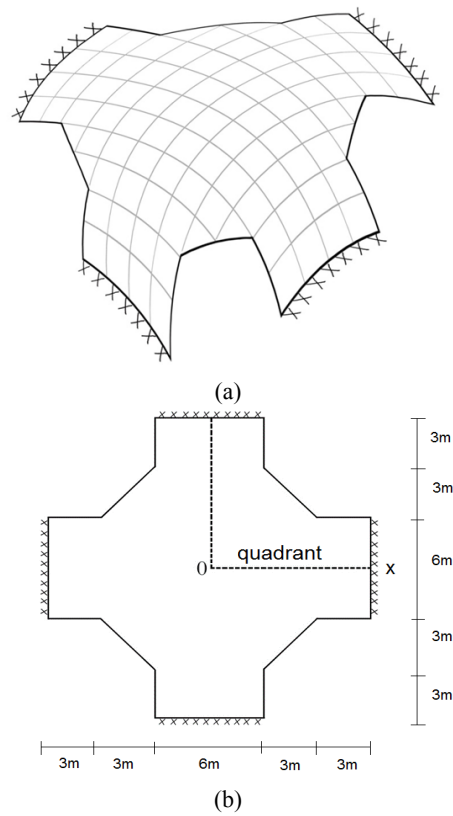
Polygon shaped spherical shell roof: (a) roof geometry; (b) plan view.
